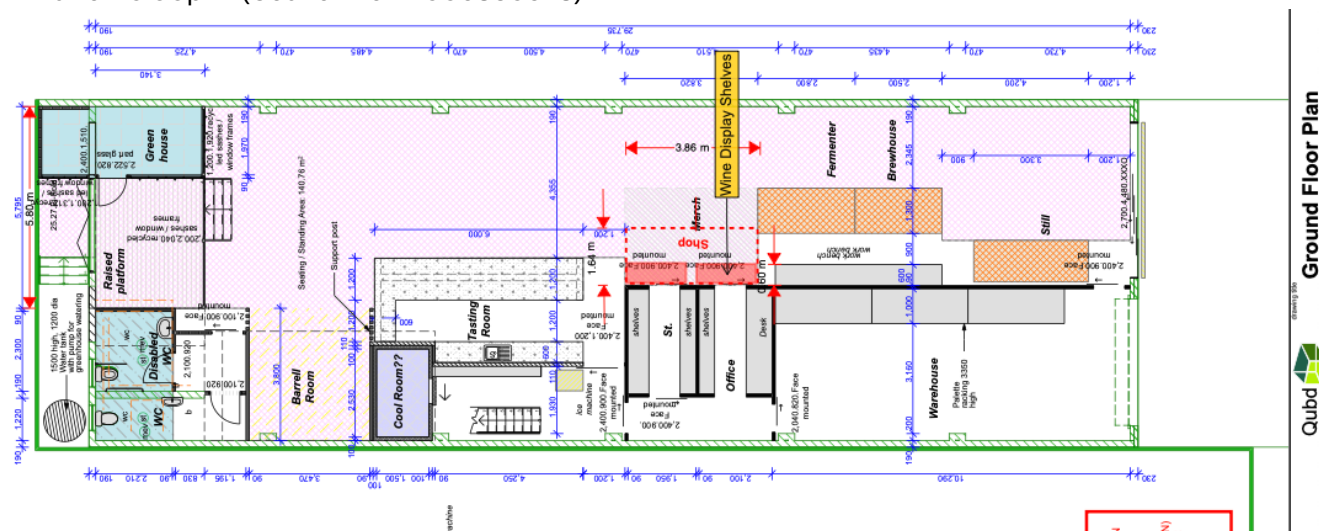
Extract of A006830528 Approved Ground Floor Plan
